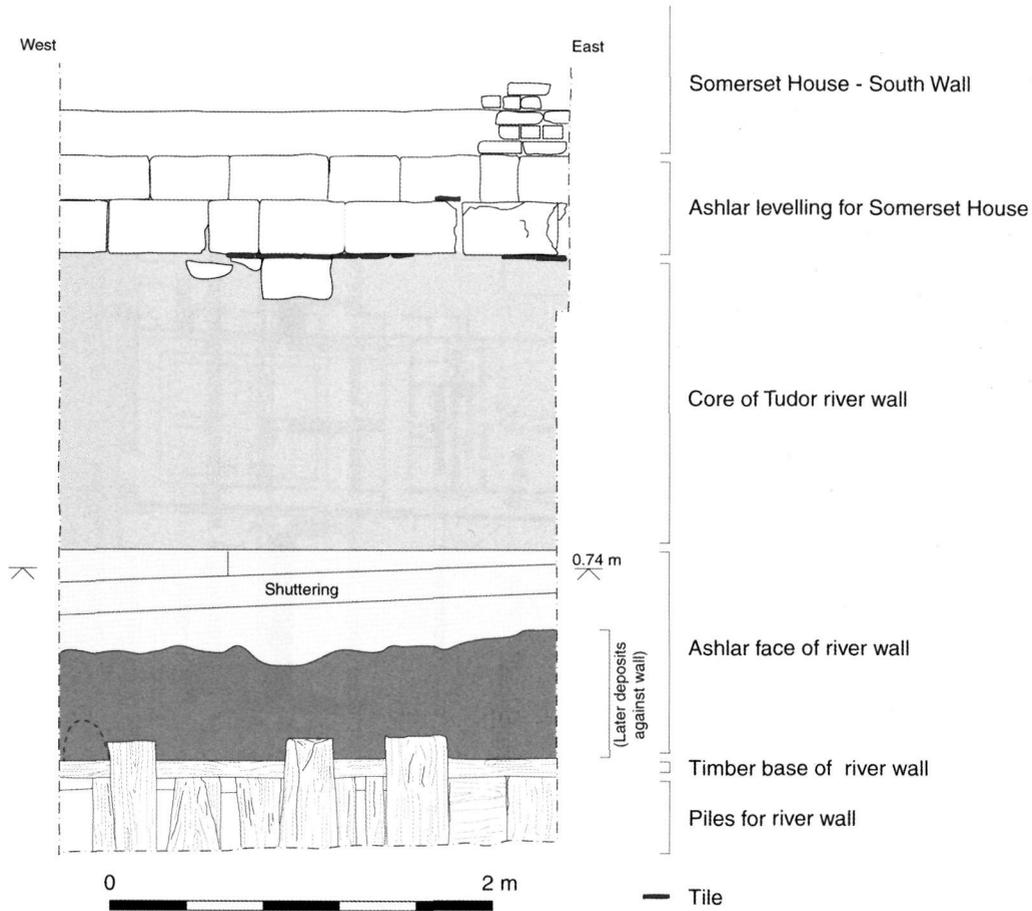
South-facing elevation of the Tudor river wall with Somerset House above
